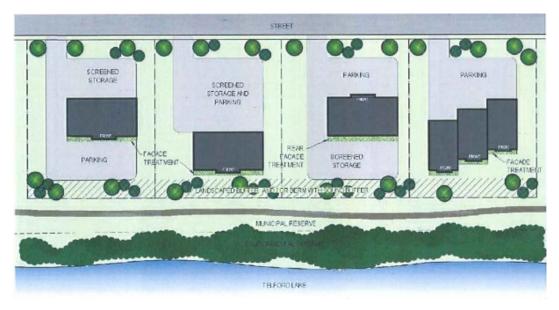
Preferred building Orientation (source: Telford Lake Master Plan)
